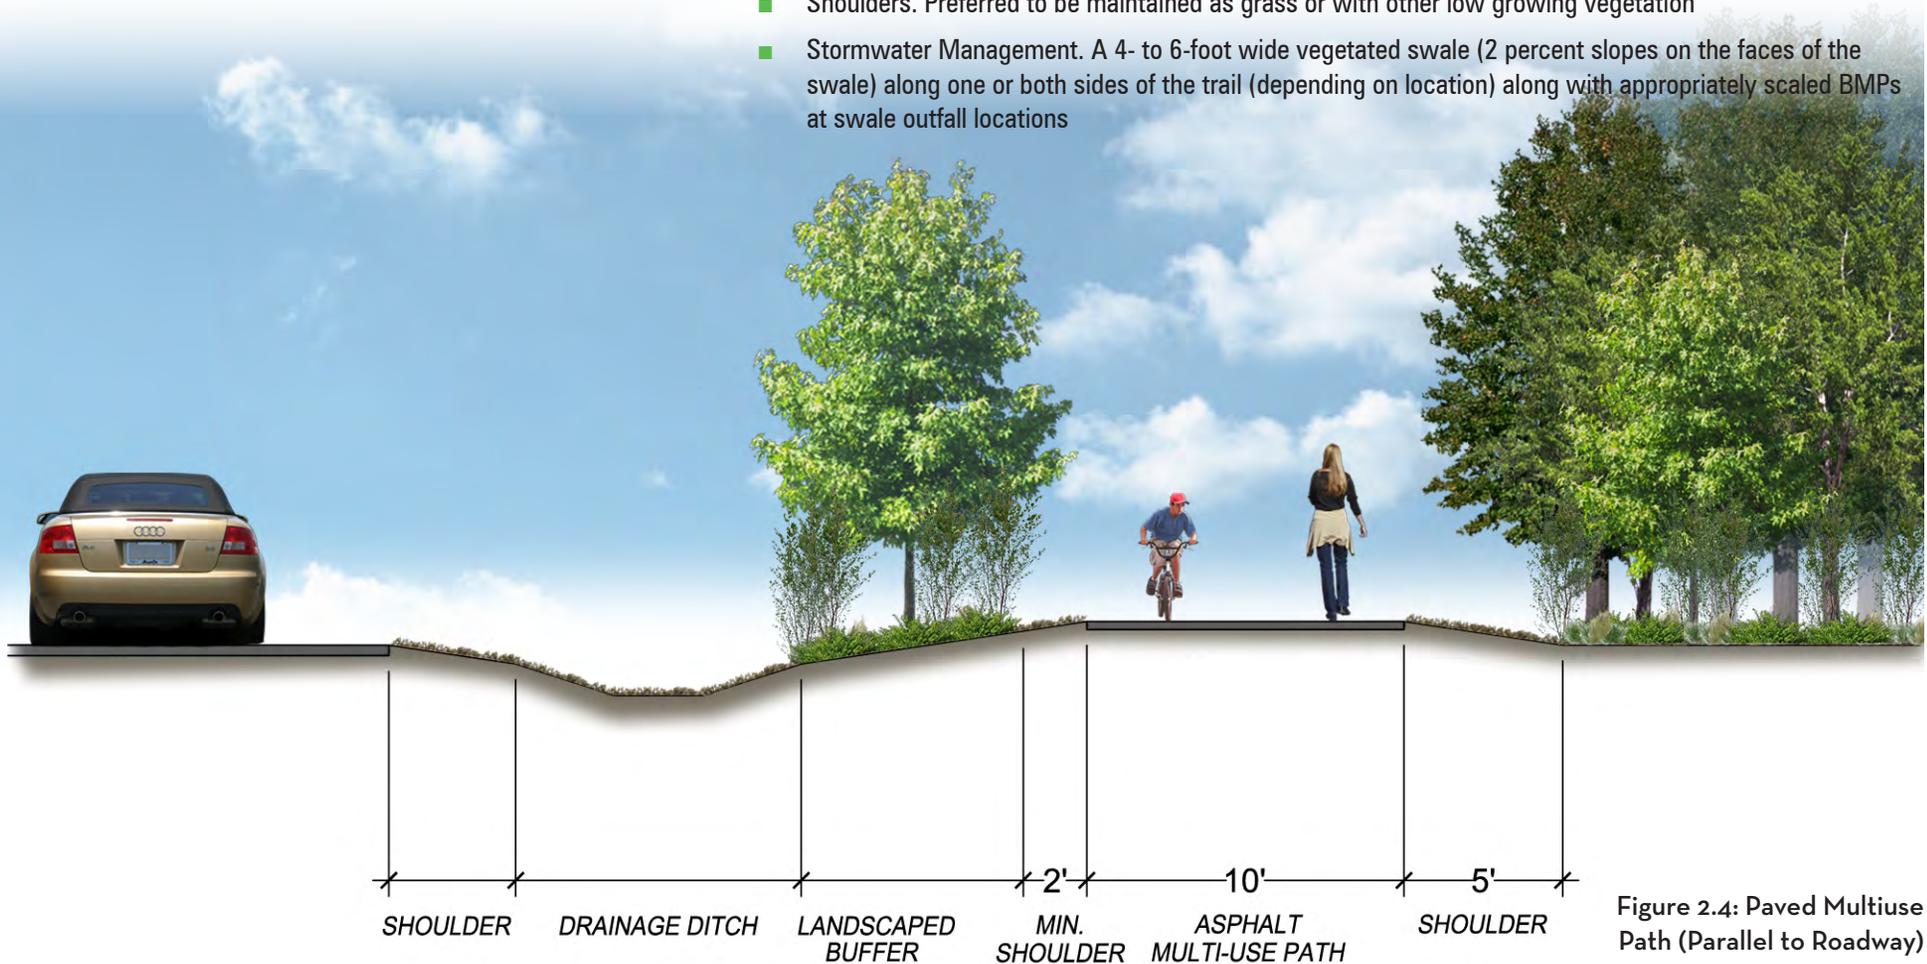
Paved Multiuse Path (Parallel to Roadway)
